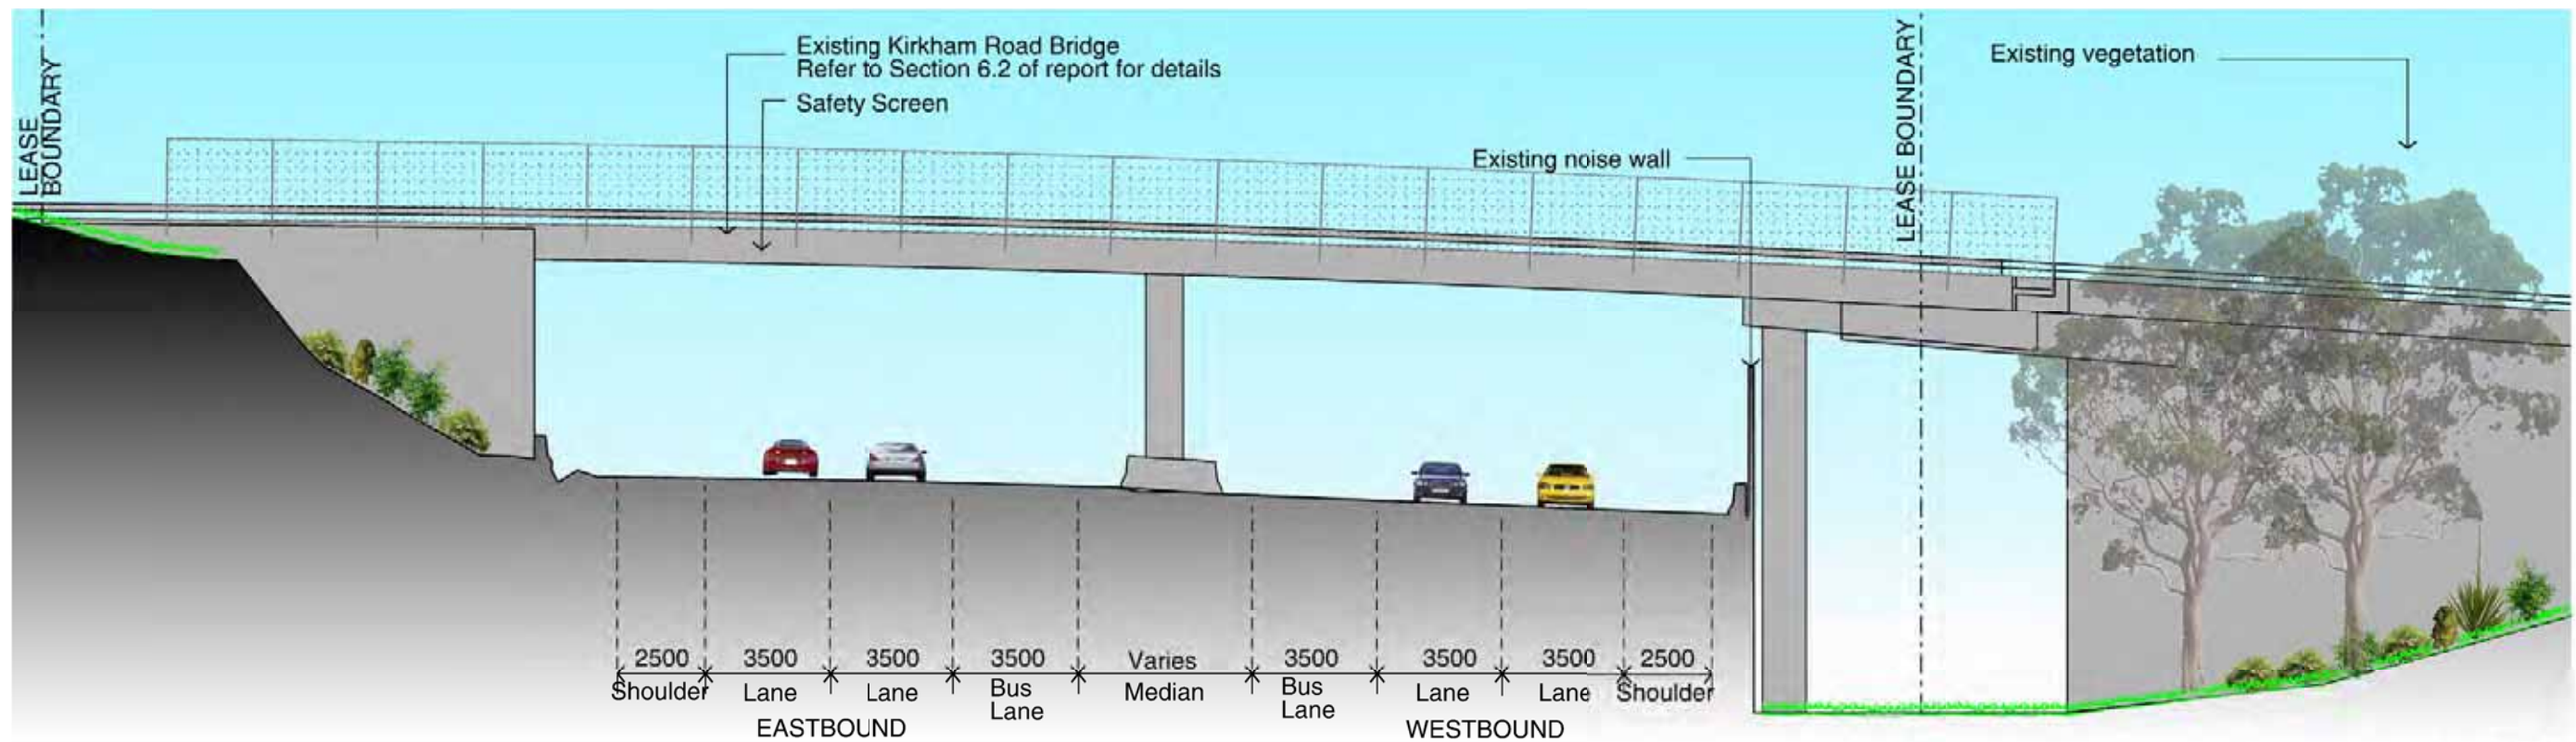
Stn 10600 Kirkham Street Bridge Area - Existing
